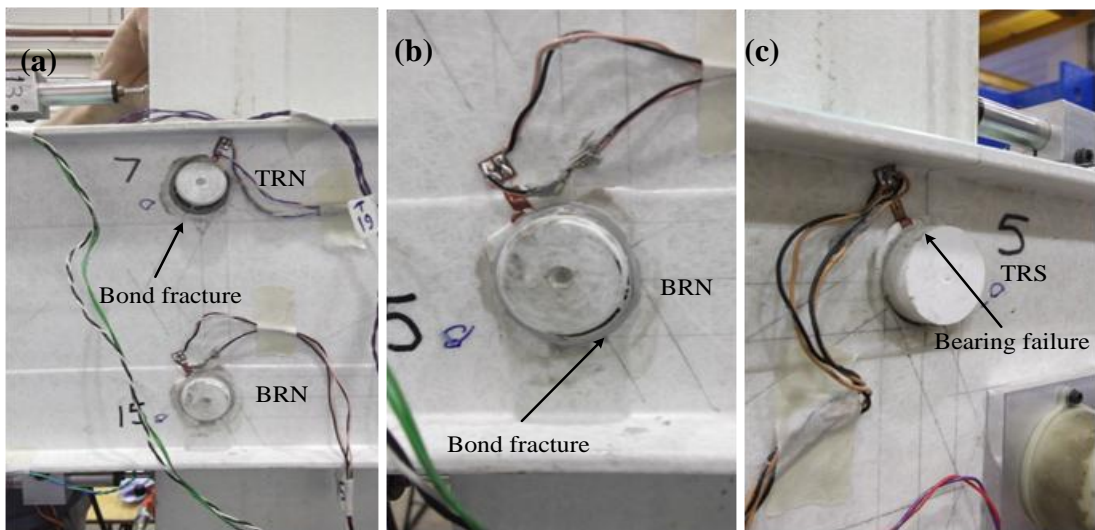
SAJ-3 failure mode: (a) bond fracture; (b) bond fracture and bearing failure; (c) bearing failure.
